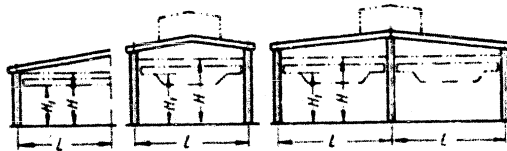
Typical Sections of One-Story Industrial Buildings with Exterior Water Drainage
